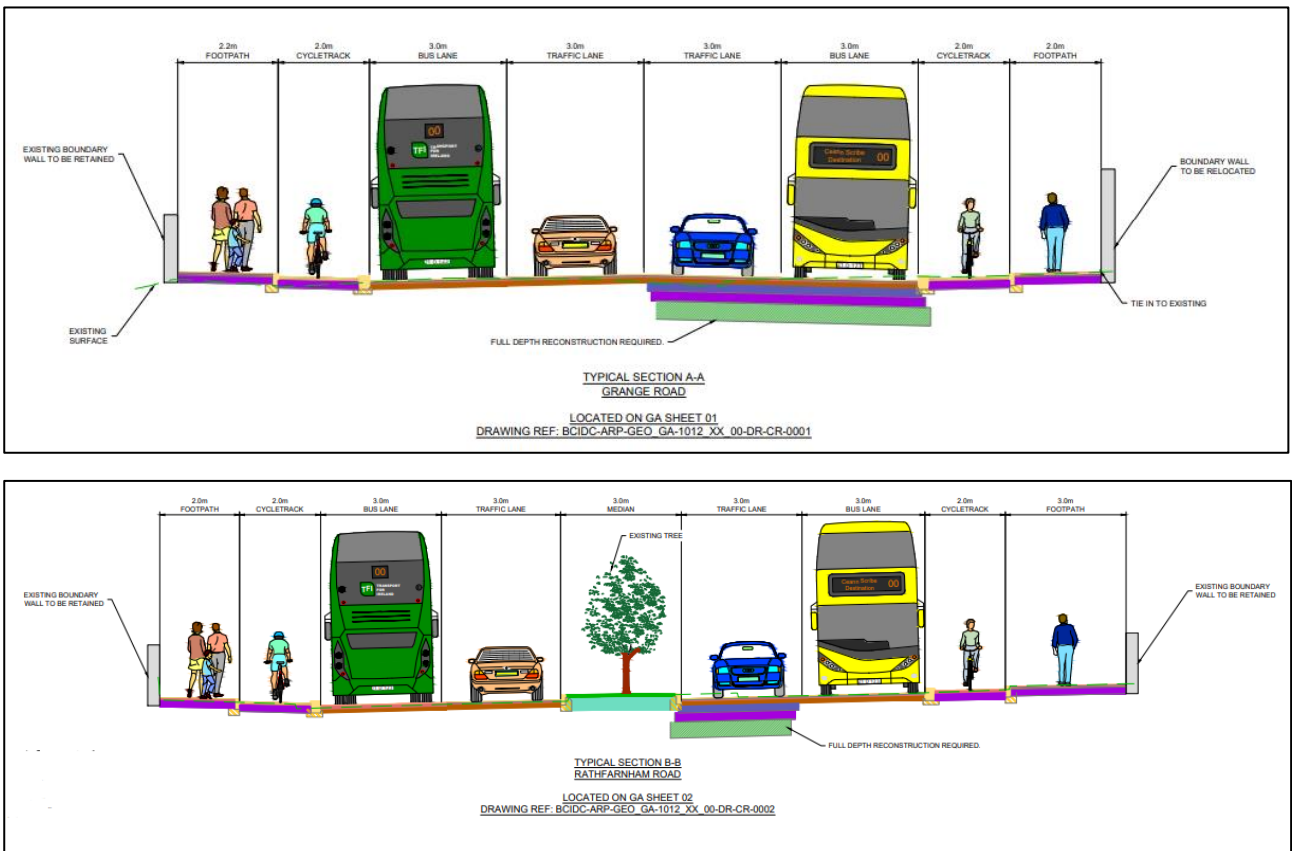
Typical Cross-Section adjacent to Rathfarnham Castle Park
